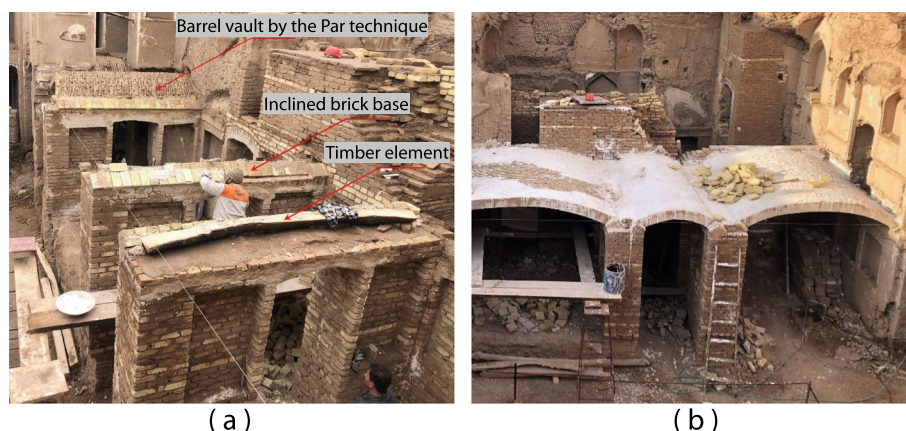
Wall-barrel vault connection details in Yazd adobe architecture: (a) using timber element and brick course at the vault impost and (b) finishing by the application of gypsum grout (Source: Ehsan Raad, during reconstruction work on the Mortaz house)
